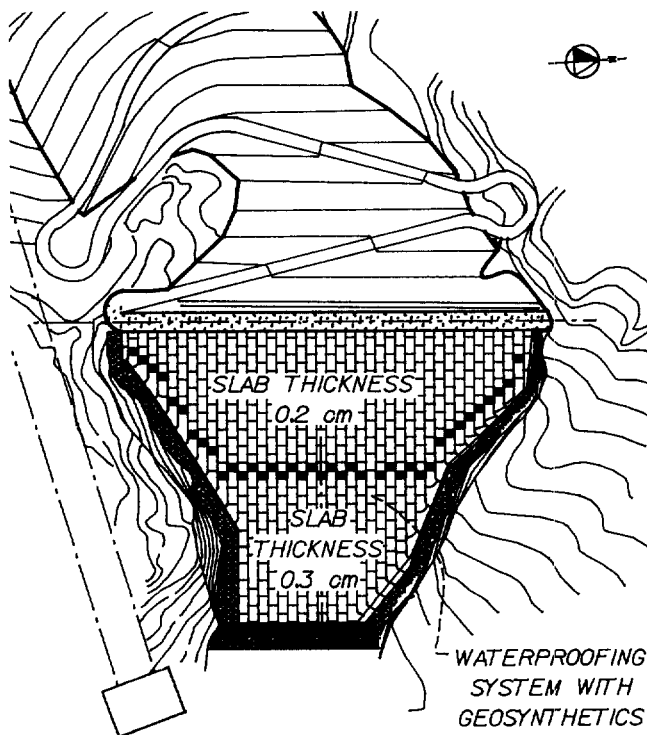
The plan of Bovilla dam with waterproofing based on a geosynthetic system and a cast-in-place concrete slab as a protection.
